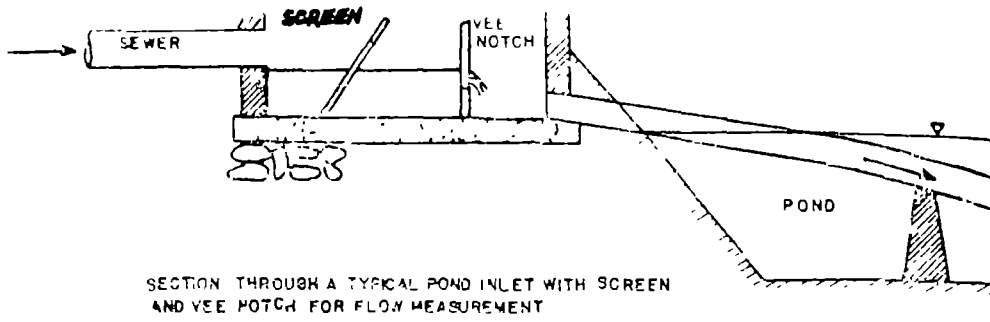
Typical pond inlet, outlet and interconnections (Arceivala 1973).
